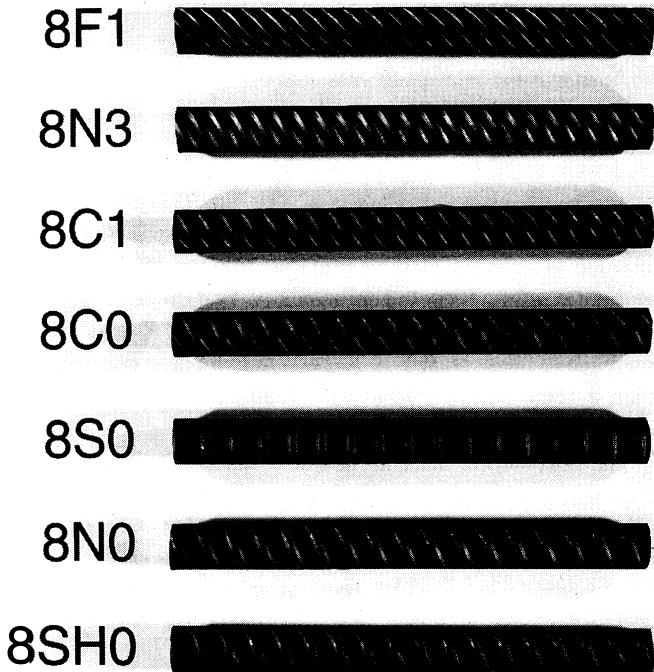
(a)—Reinforcing bar deformation patterns, No. 8 (25 mm) bars
